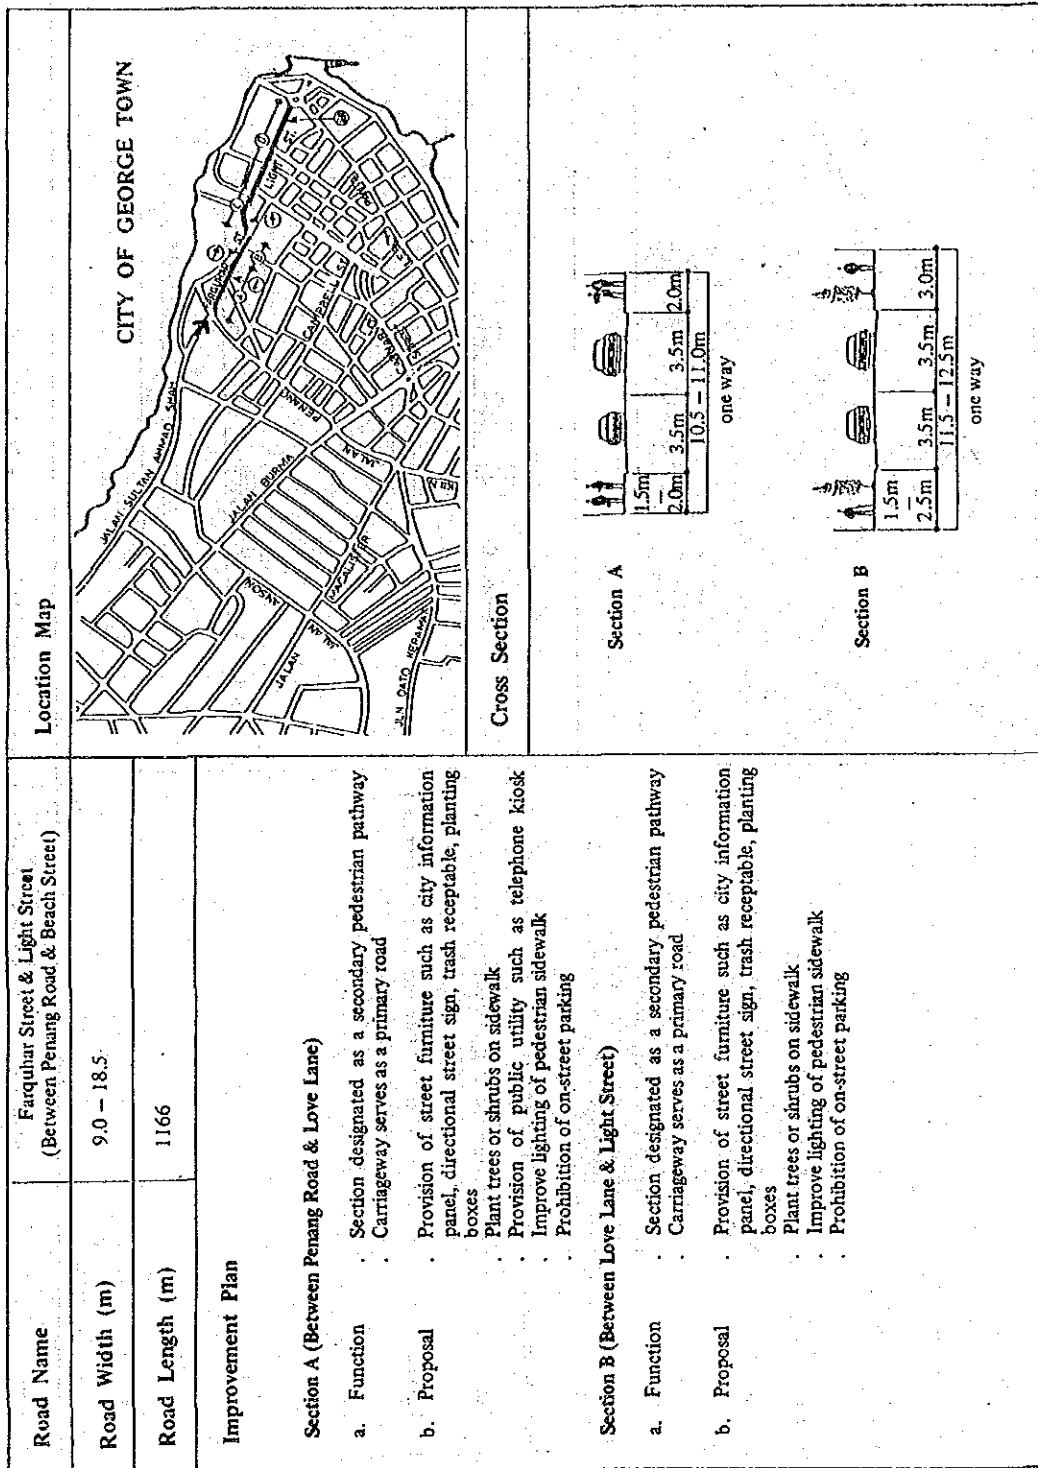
Pedestrianisation Improvement Plan (12) – Farquhar St. & Light St.
